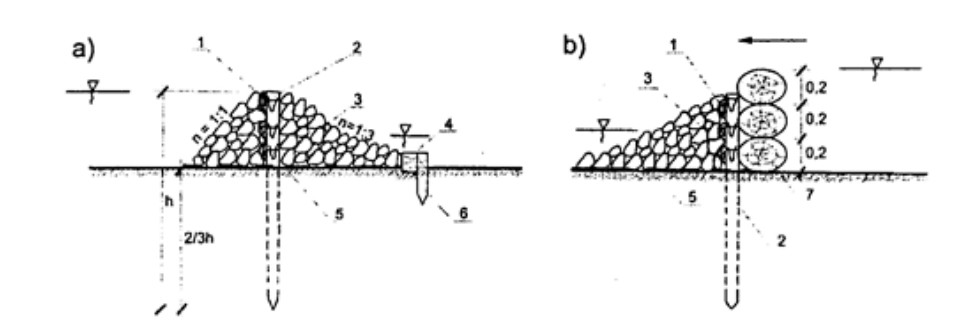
Examples of sills made of: a) wood and stones; b) wooden logs and stones. 1 – wooden slat, 2 – wooden pole, 3 – stones, 4 – wooden beam, 5 – geotextile, 6 – small pile, 7 – wooden log, h – log length. Figures by Jędryka.
